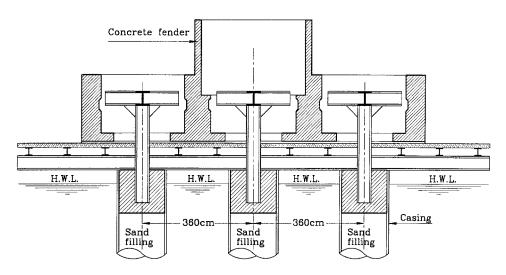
Pouring the Bottom, Forming Working Rooms, and Pouring around Working Rooms
